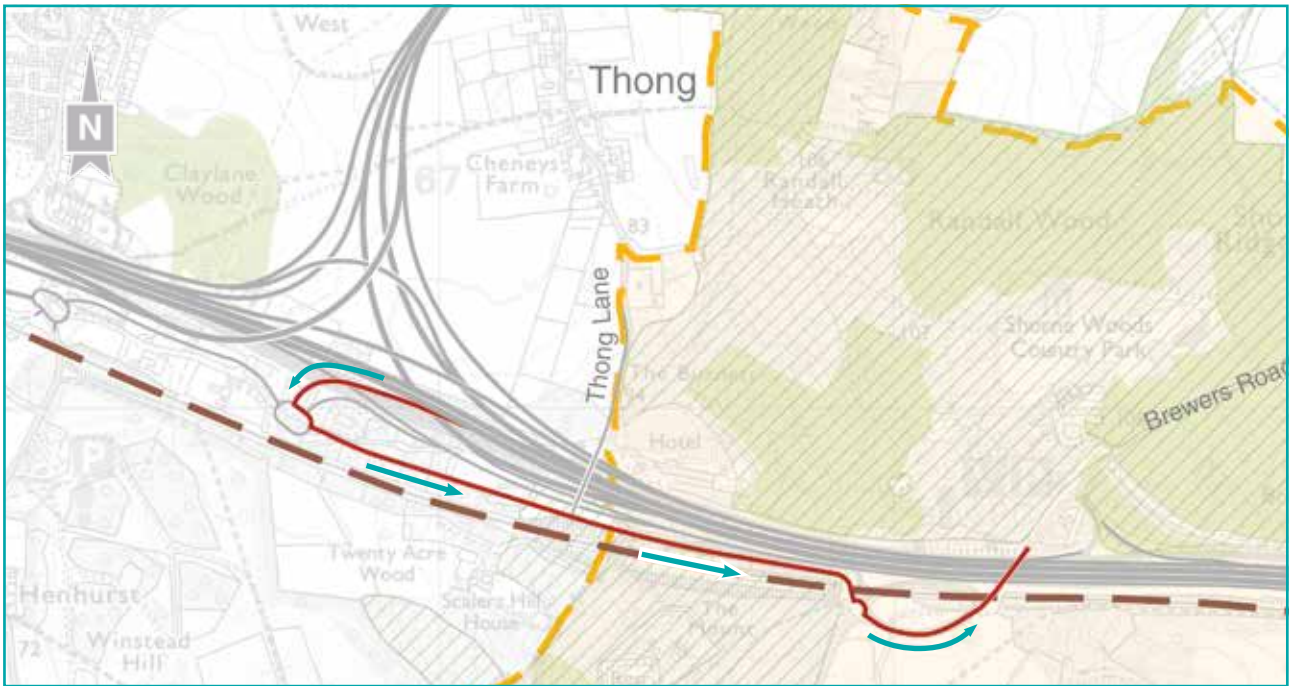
M2 westbound to Brewers Road. Leave the M2 westbound using a slip road that connects with the local network via a new roundabout at the site of the existing A2 service station. From the roundabout head east along the new two-way local link road towards the roundabout on Halfpence Lane and Brewers Road.
